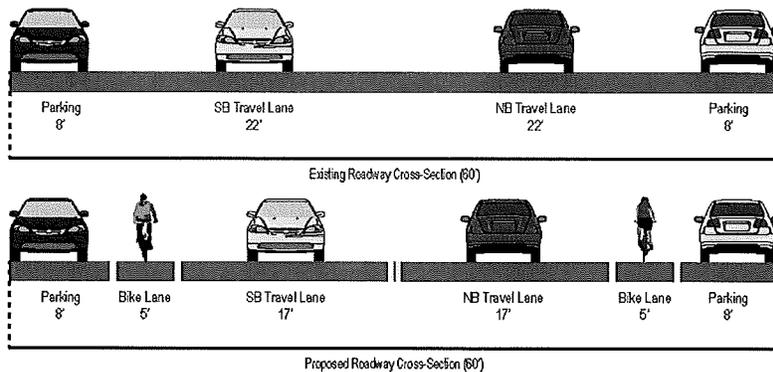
Project Sheets 6 and 7: Sherman Street/Blair Avenue/7th Street & Encinas Avenue
